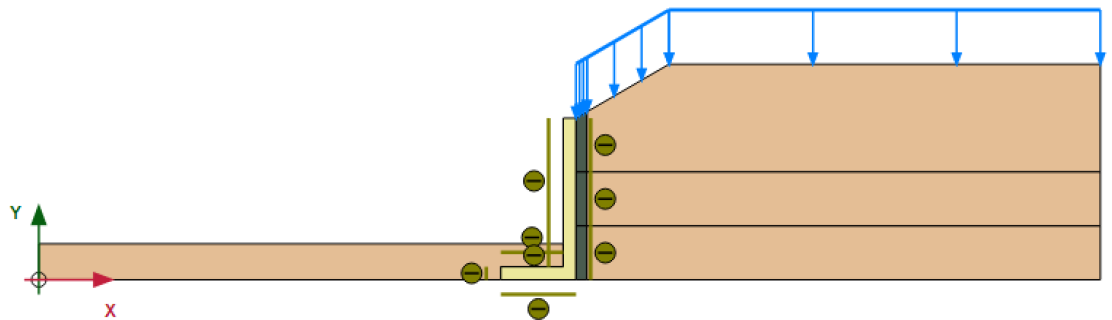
Retaining wall with backfill slope 30° and 0.3m TDA backfill
